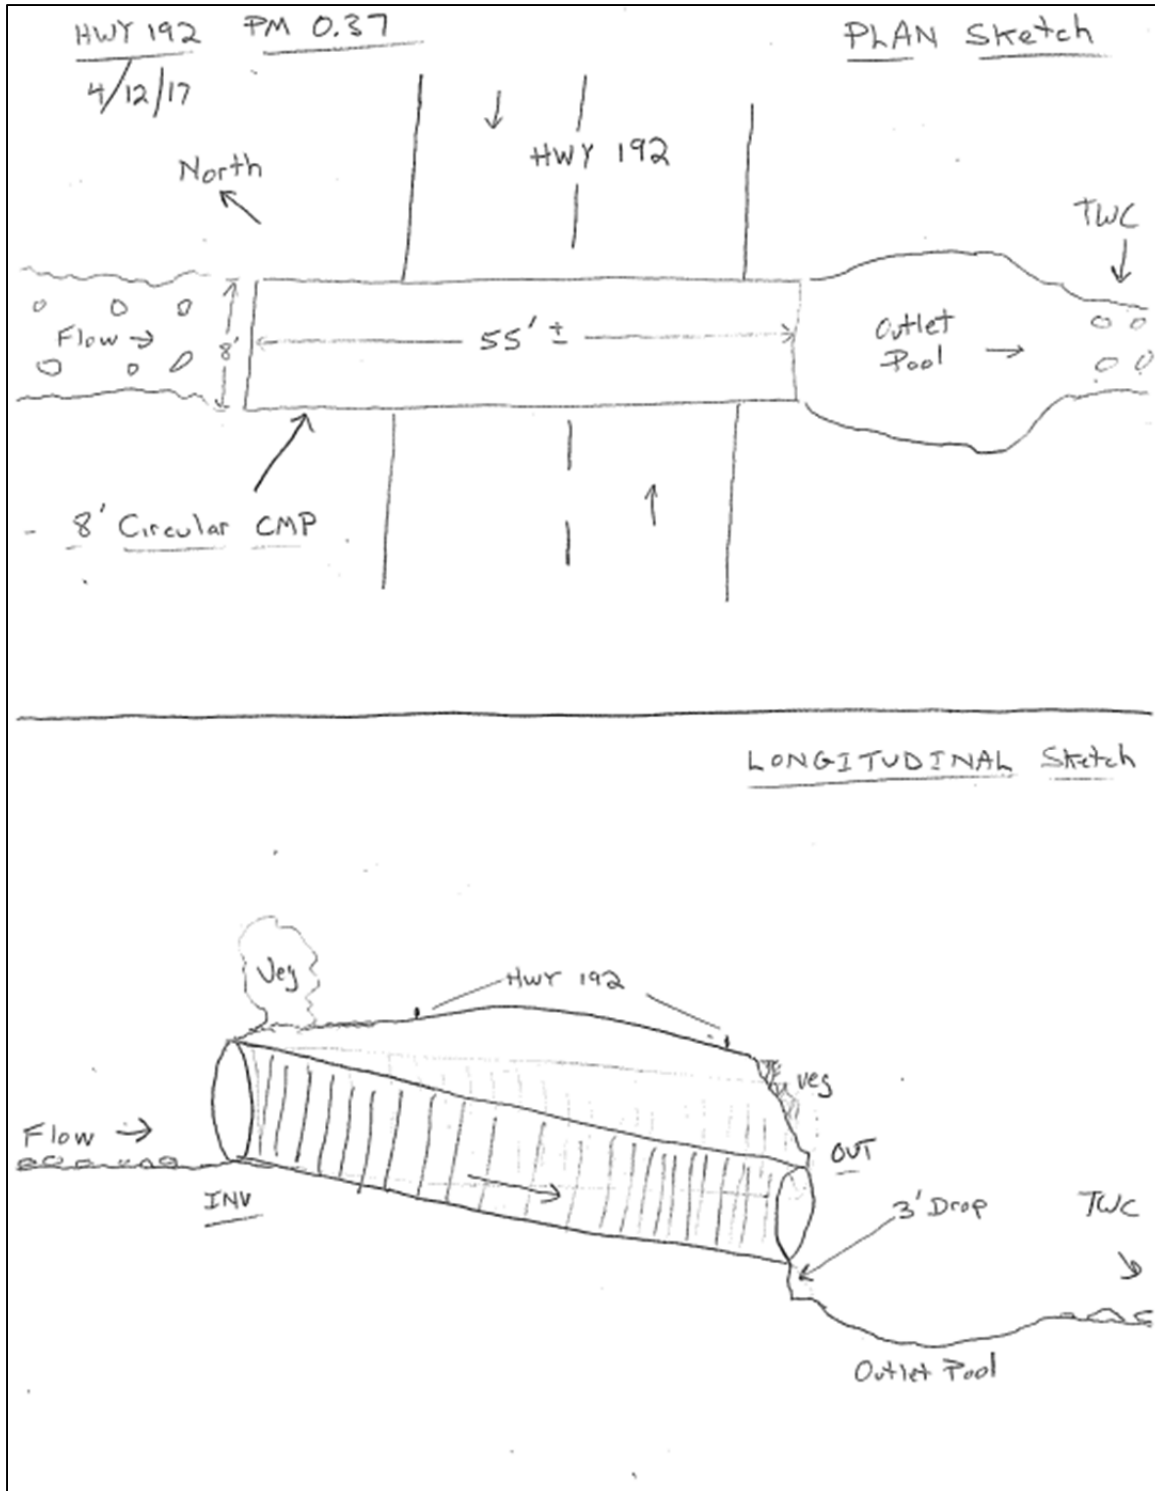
Site sketch for Santa Barbara County, Route 192, PM 0.37.
